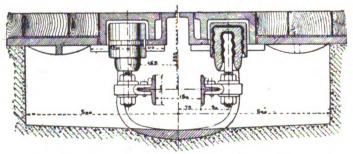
Shallow Conduit on the Pont d'Alma.
